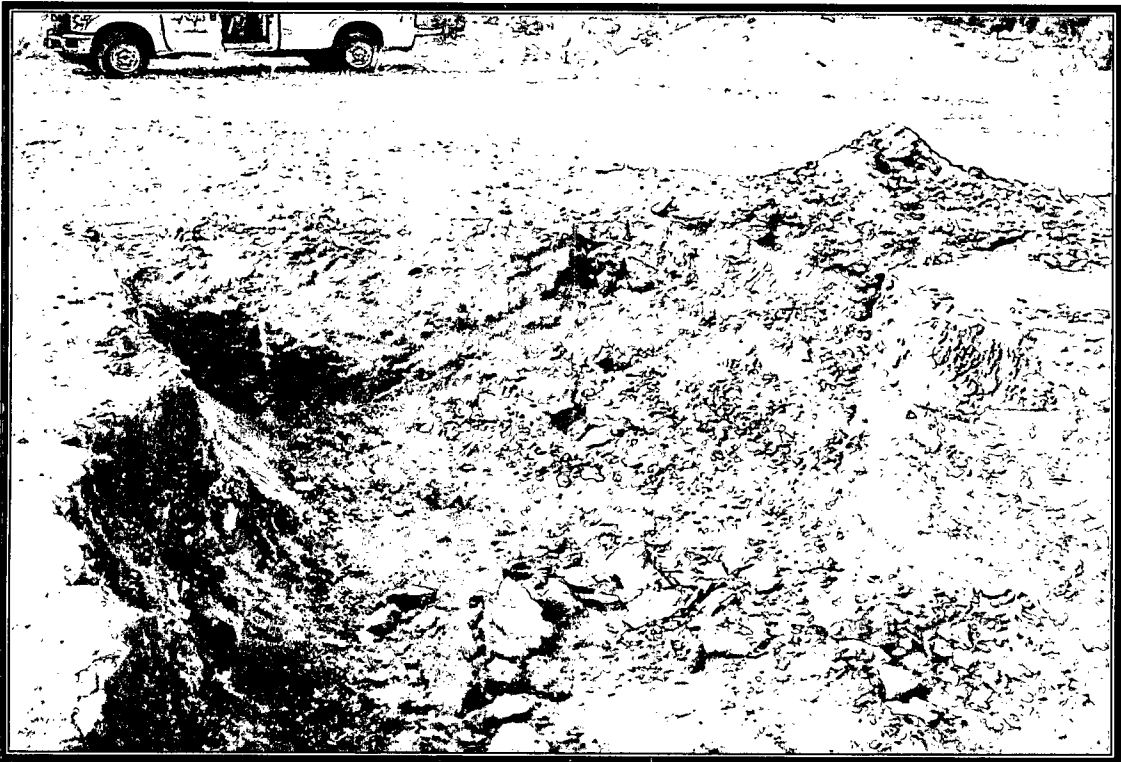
View of the excavation on 3/14/13 at the Howell M#1A site. View to the west.
